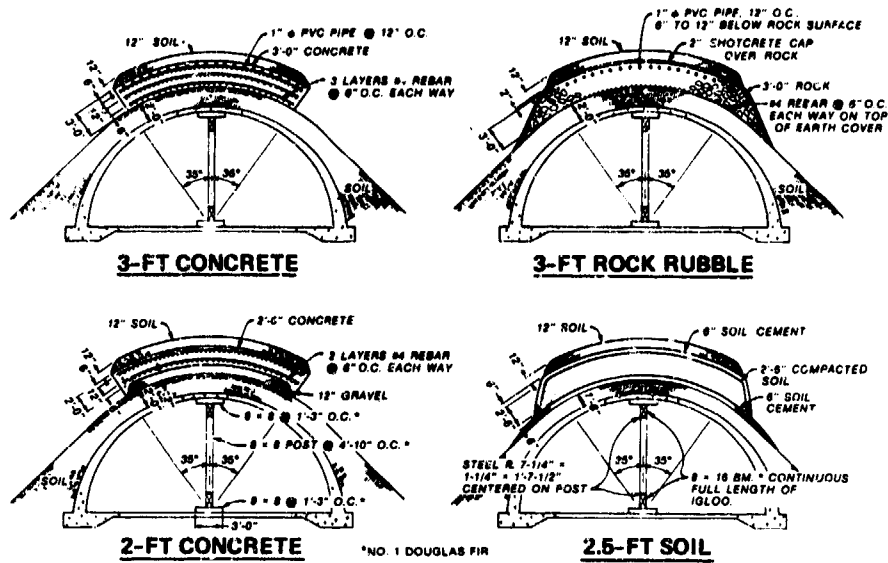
Cross Section of Cover Sections and Internal Bracing.
